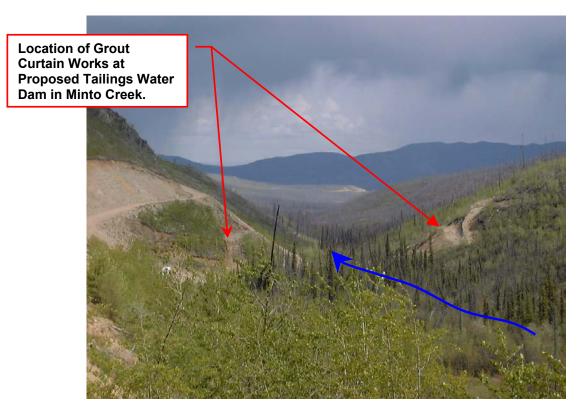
Proposed Location of Tailings/Water Dam (Looking Downstream on Minto Creek)
